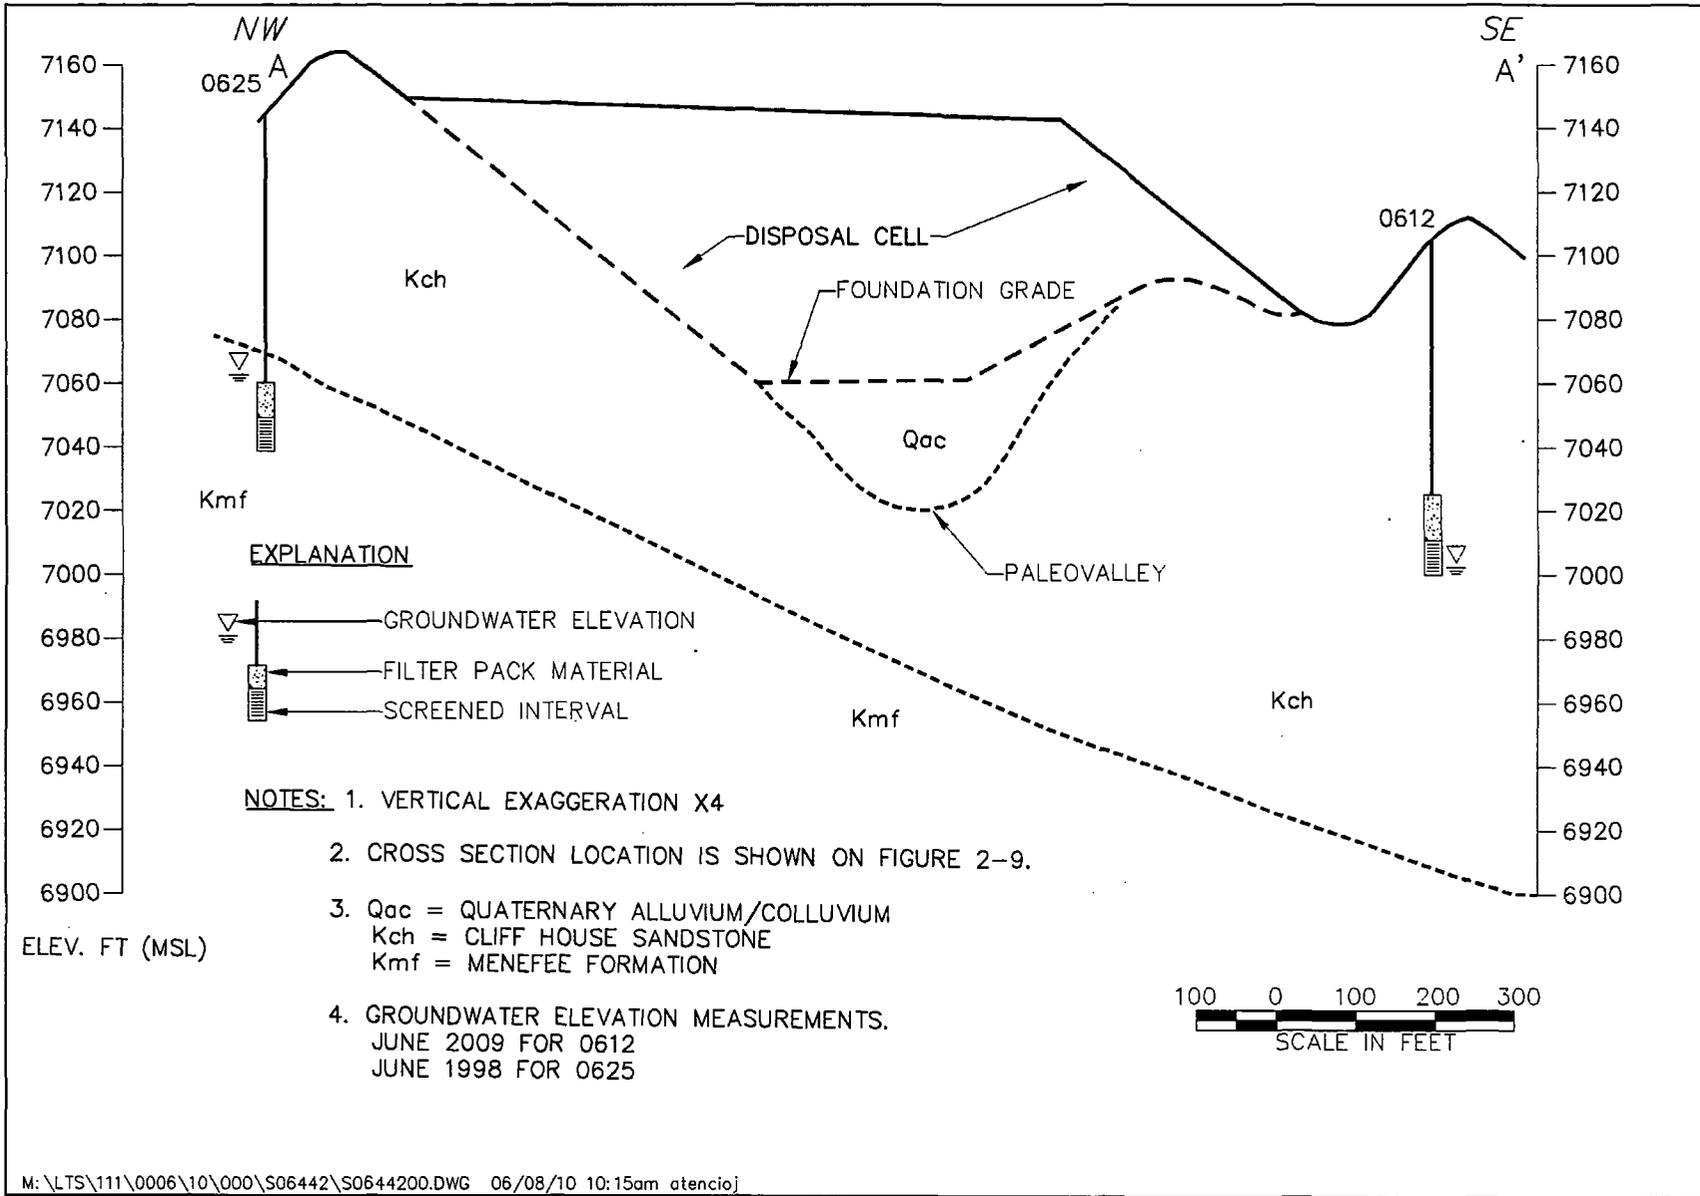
Cross Section A-A', Durango, Colorado, Disposal Site
